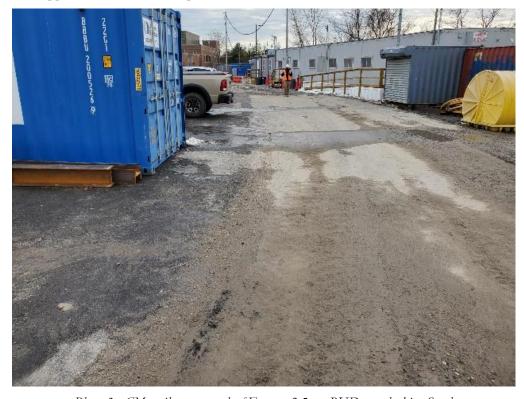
CM trailer area south of Eastern 2.5 acre BUD area looking South
